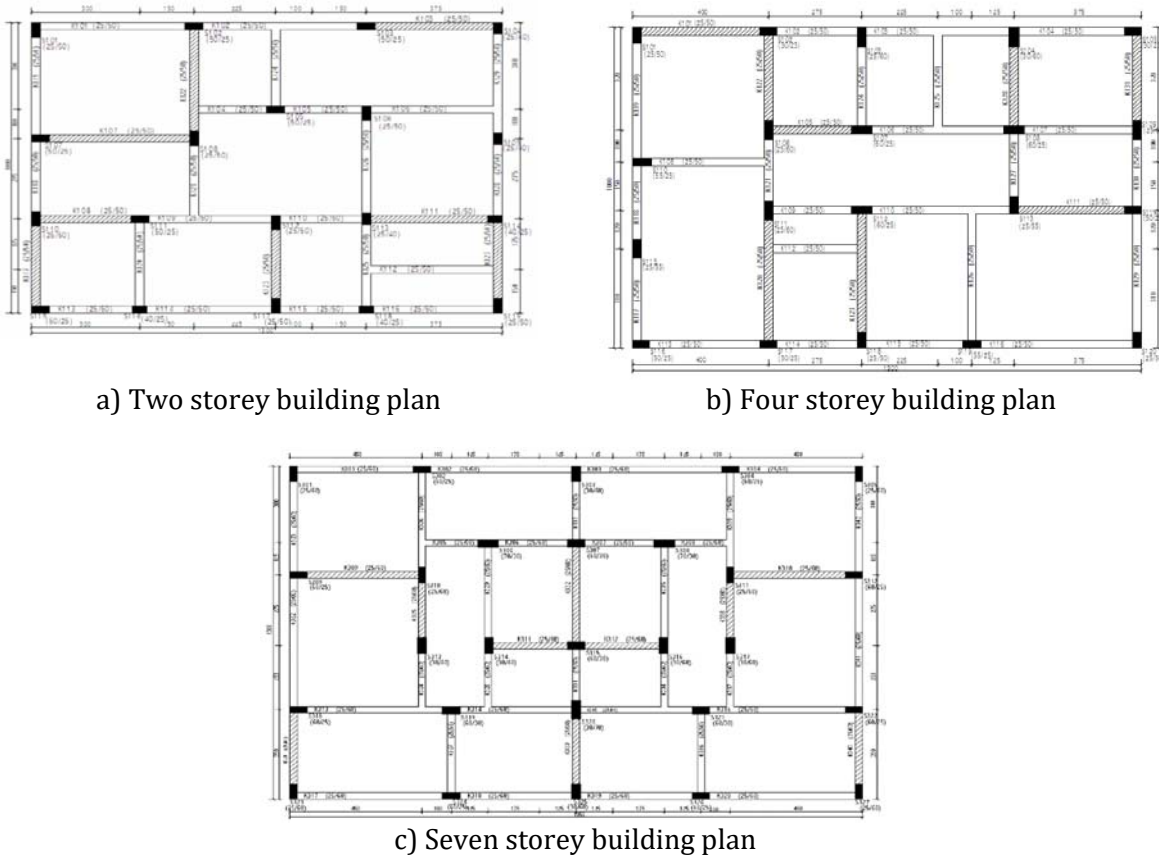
Plan views of the buildings considered in the study. Shaded areas represent walls with load bearing ability.
